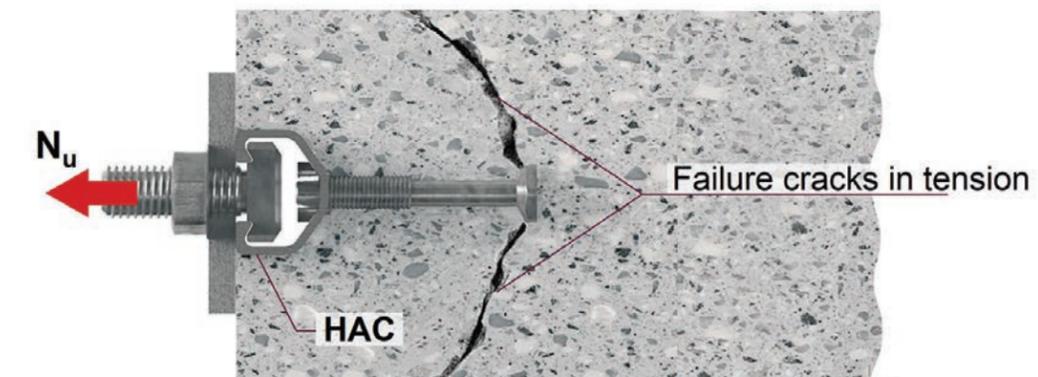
Concrete breakout in tension of a cast-in anchor channel with rounded stud head anchors (HAC) — Section View.
